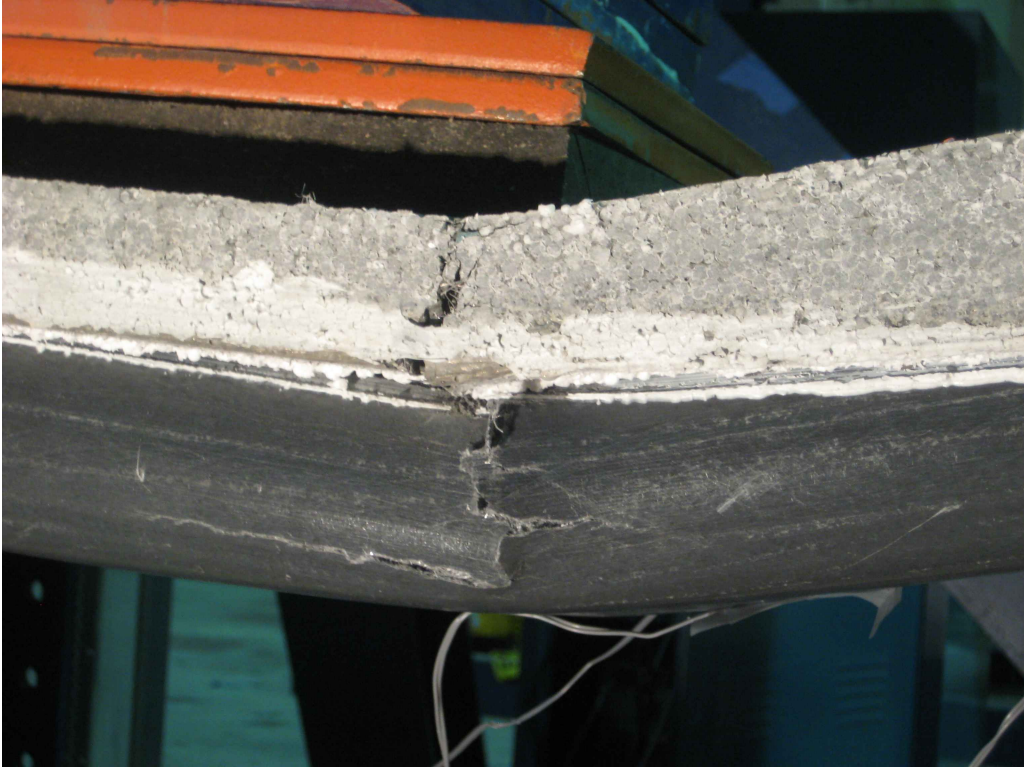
Compression Failure of Tapered Section Ductal®-FRP Deck Specimen
